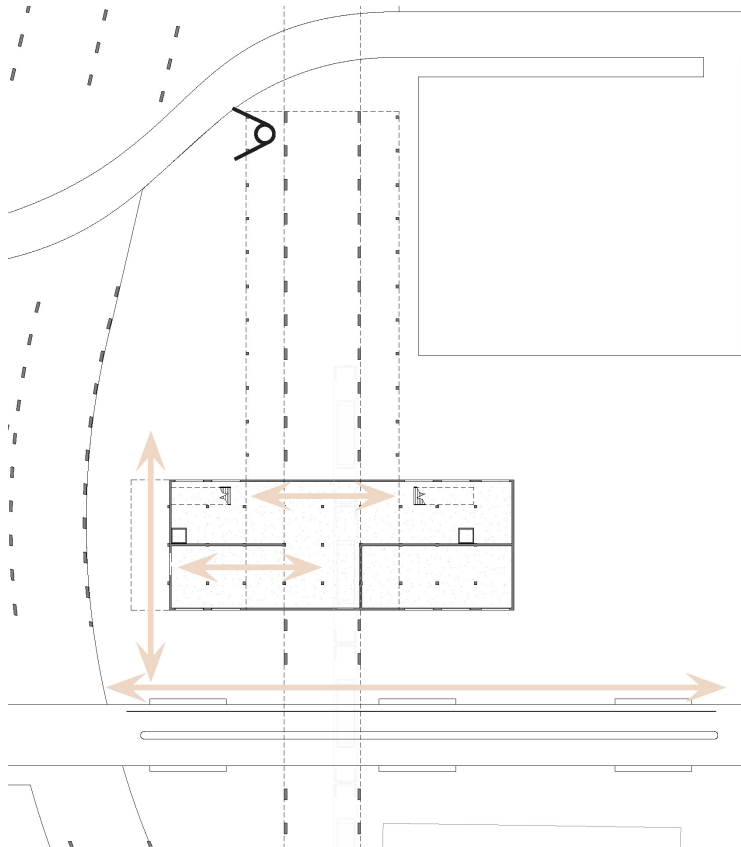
, Train Station - Enlarged Plan – Site Ground Level (Source: Drawn by Author)
